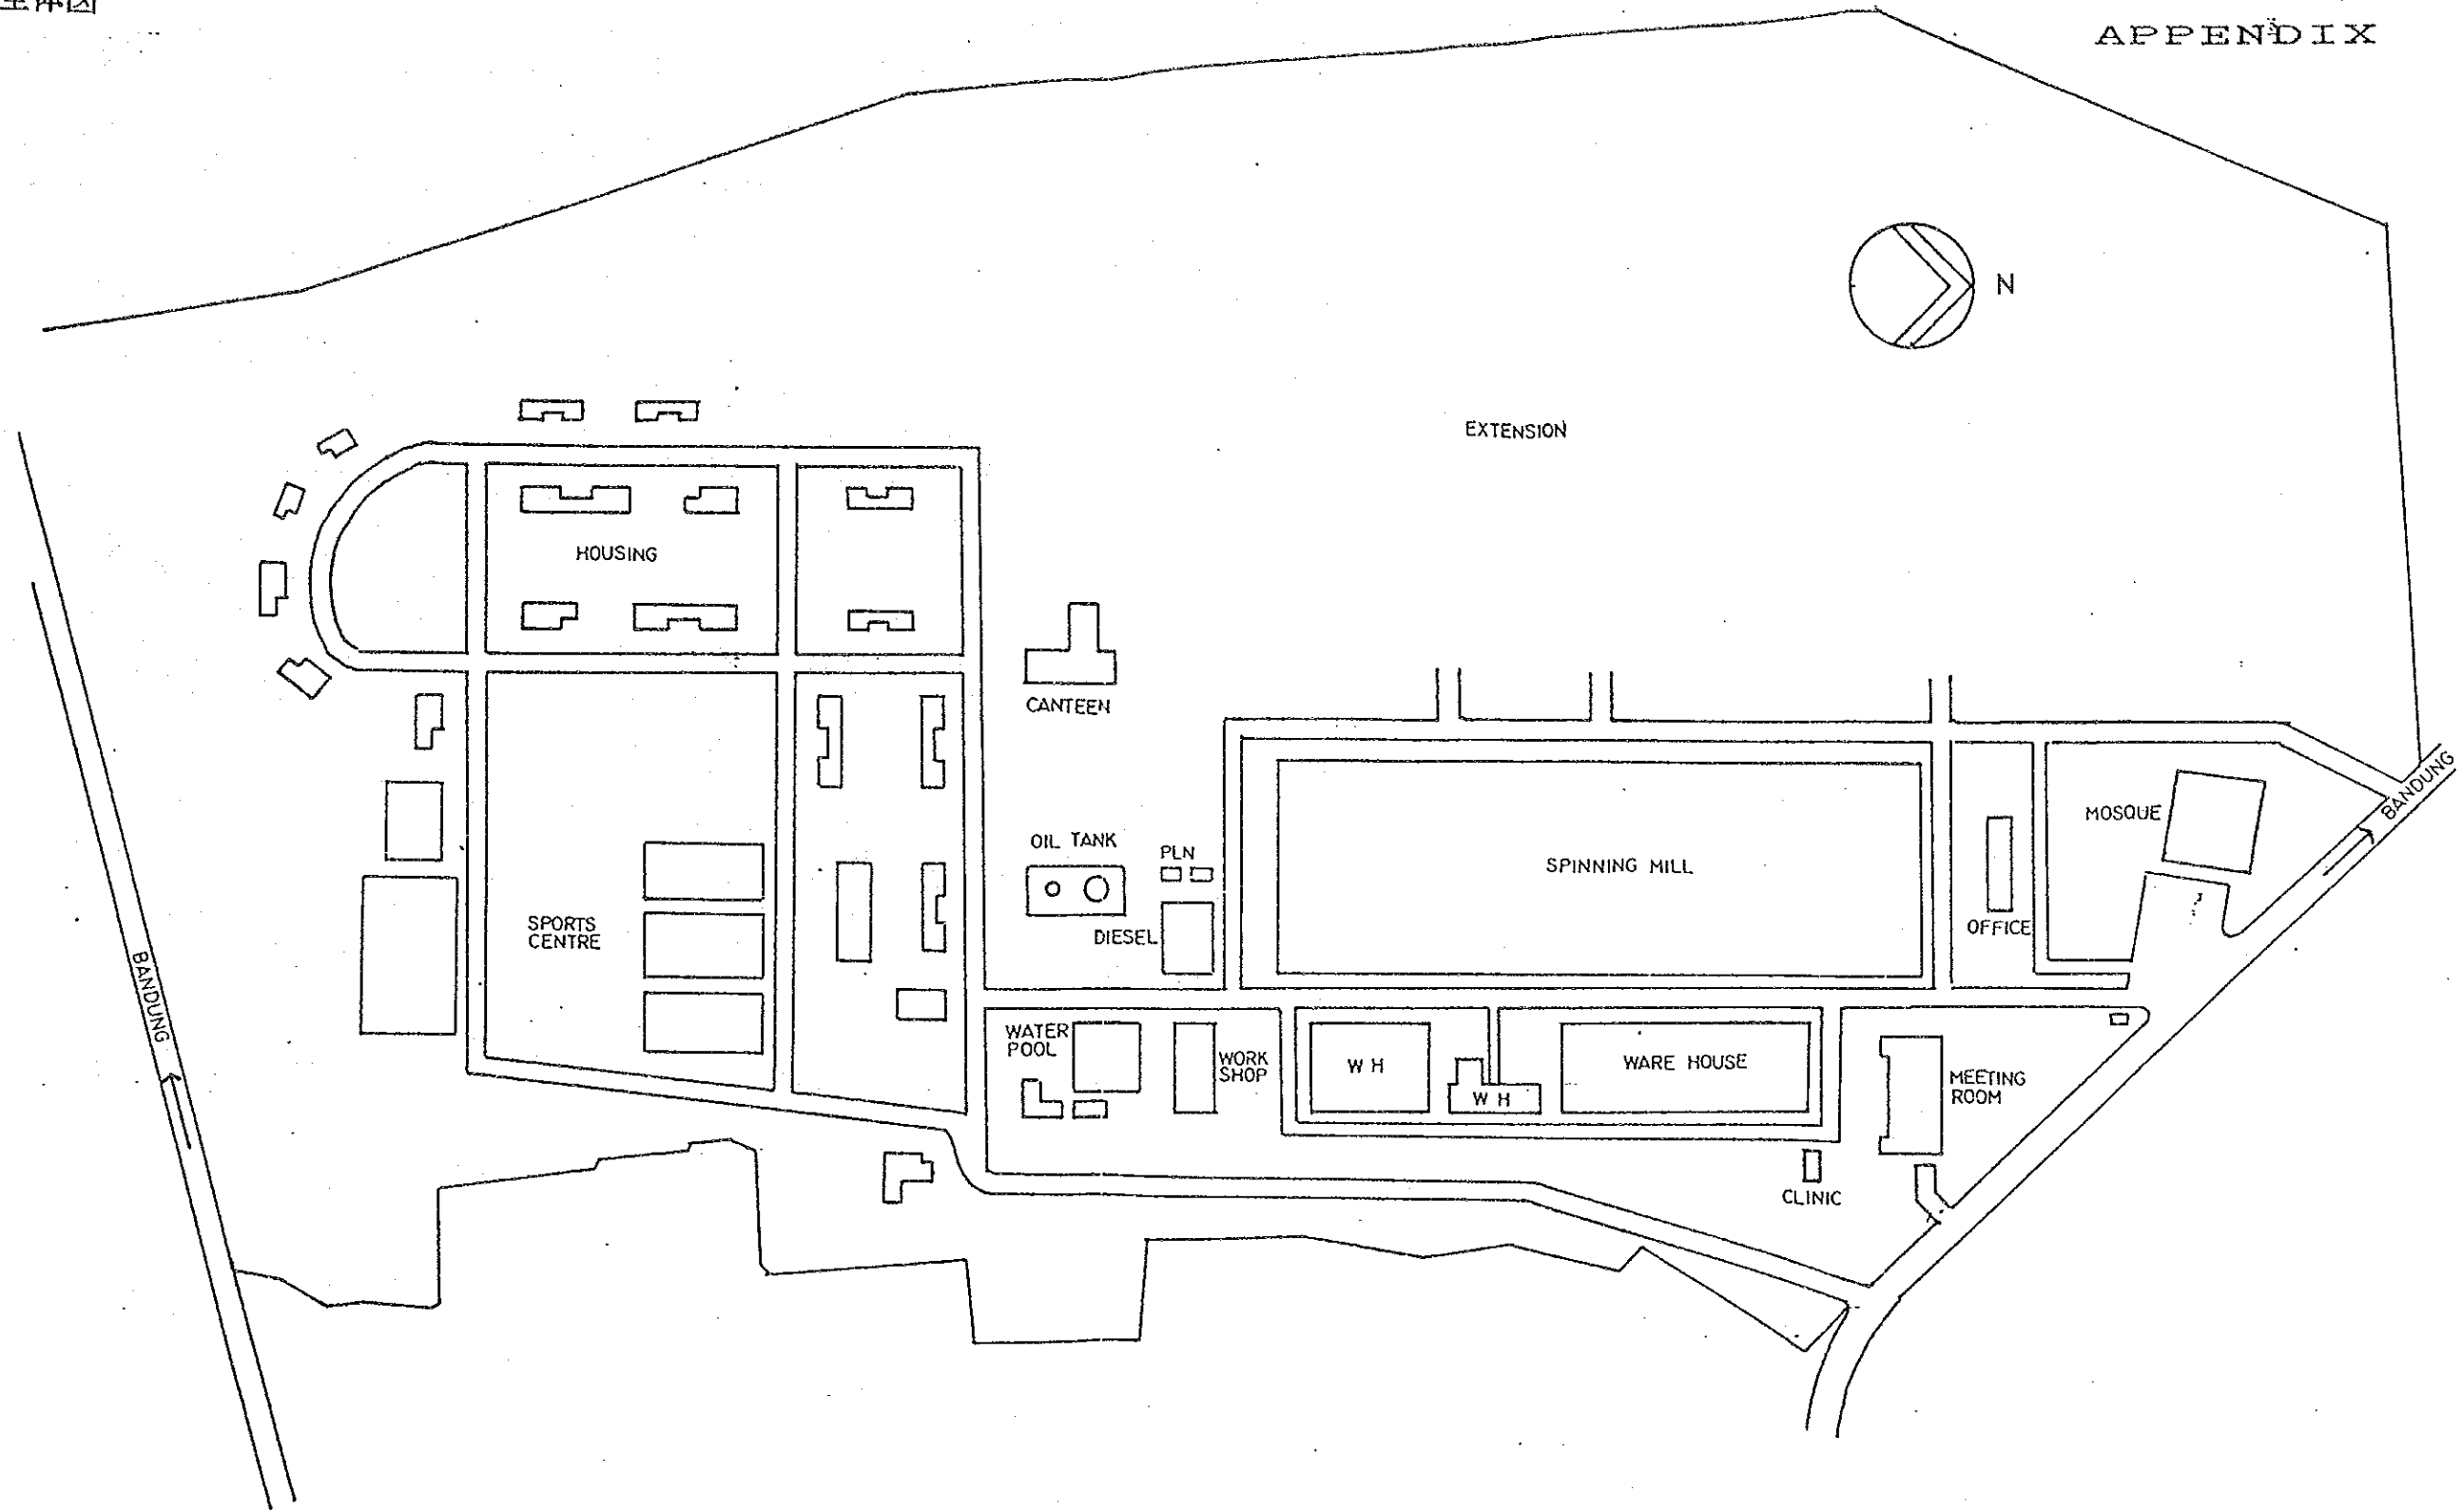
LAYOUT FOR CIPADUNG SPINNING MILL
